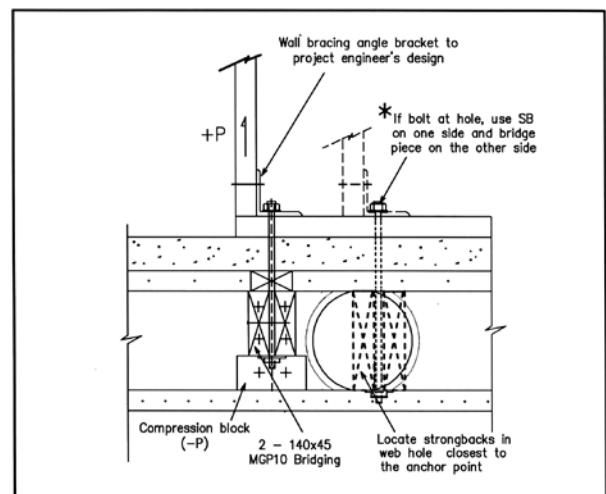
Wall bracing tie-down (Alternative detail)
